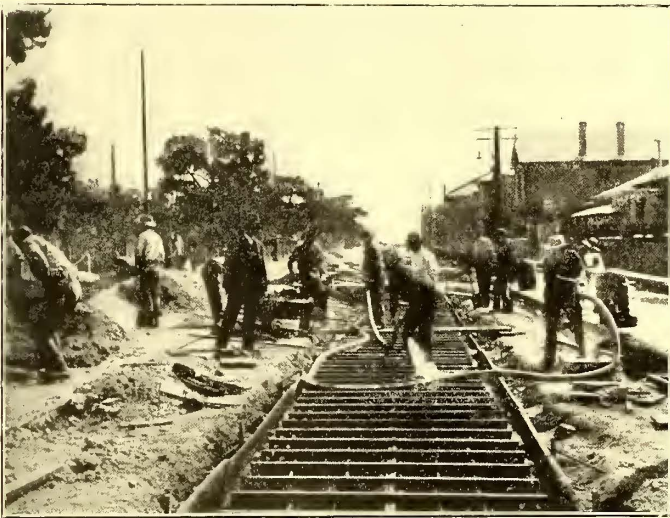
OLD RAILS USED FOR REINFORCED CONCRETE WORK
